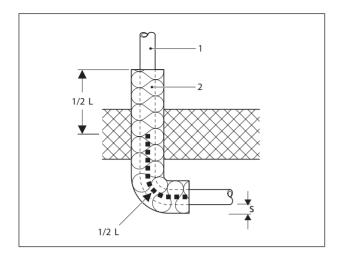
Fire protection Geberit Mepla Ø 16 - 75mm: Ceiling penetration, bend
